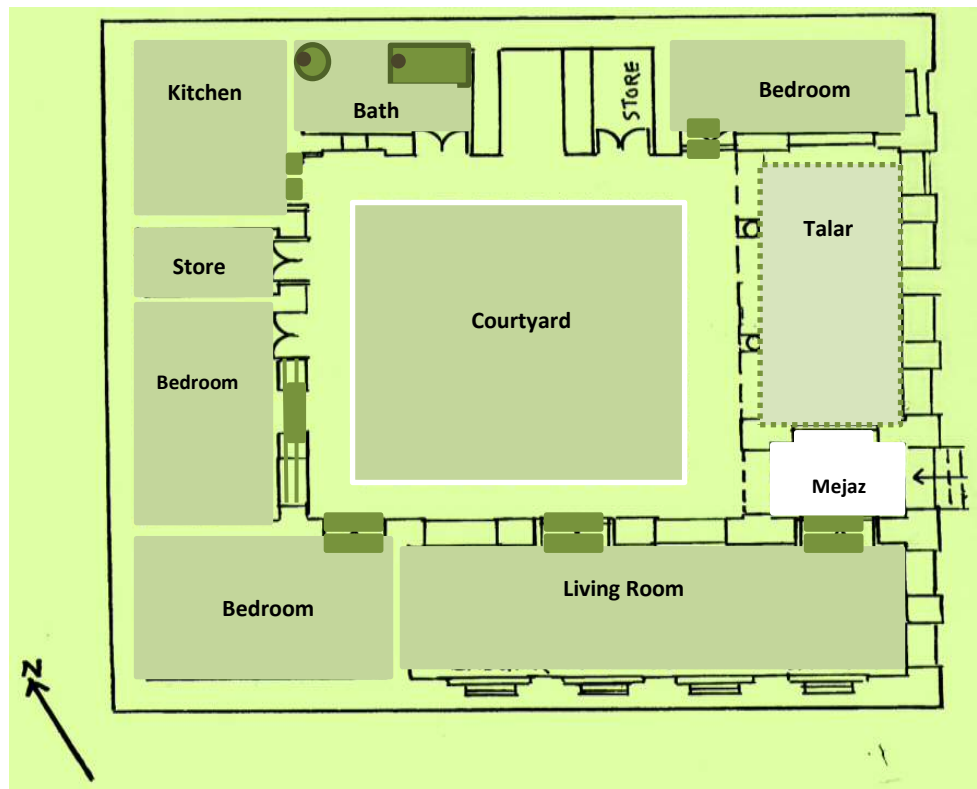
Ground floor level plan of traditional courtyard house No. 7. Scale: 1:50
